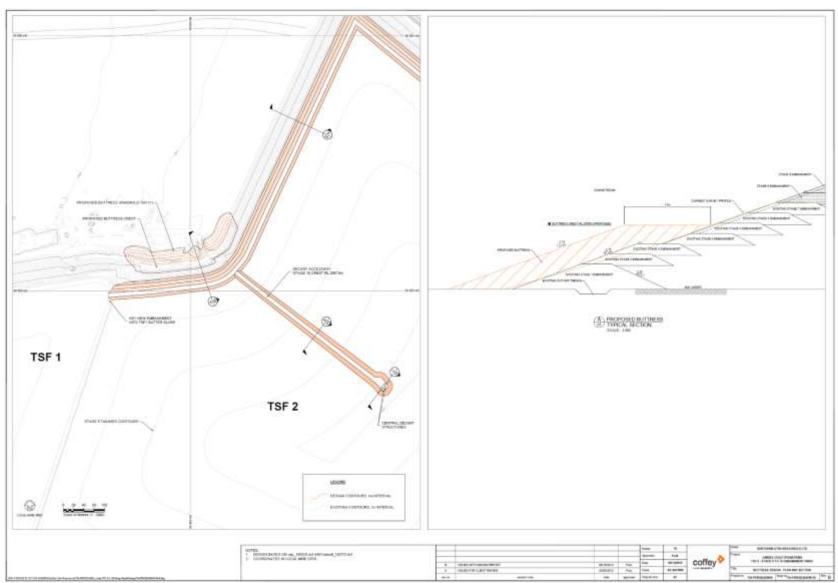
Jundee Gold Operations – TSF2 – Stage 9 to 10 embankment raise – Buttress design – Plan and section
